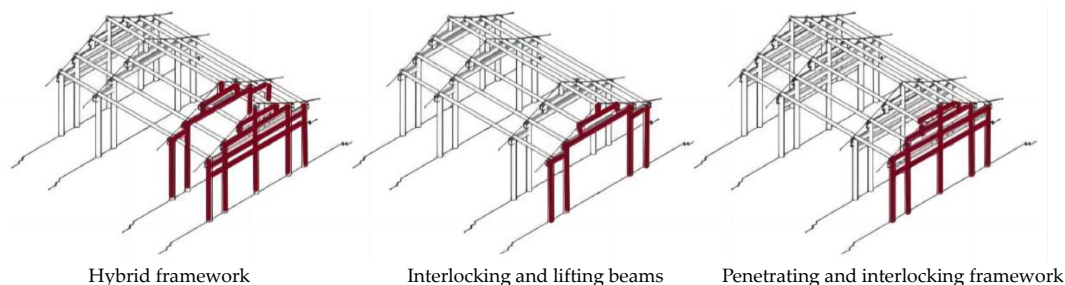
Three structural types of traditional Bai ethnic dwellings.
